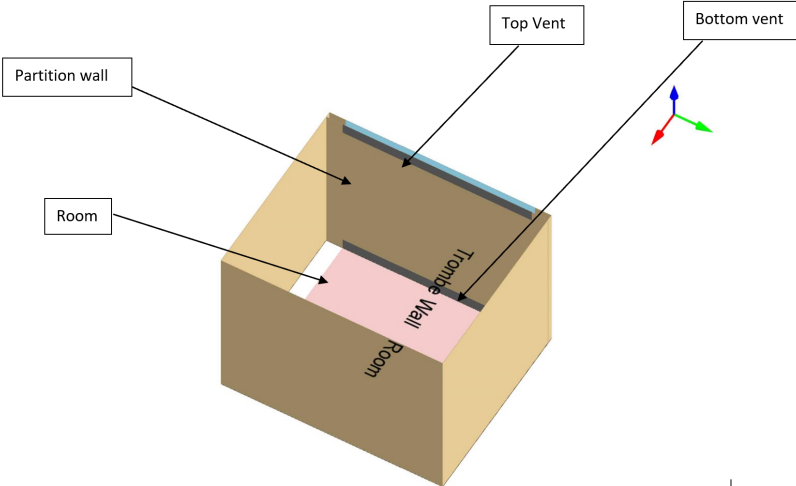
3D model of a single-story building with a Trombe wall
